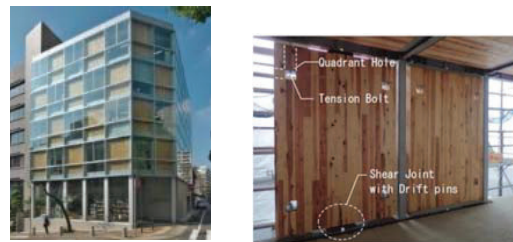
Building of steel frames with CLT infill in Japan: Hyogo Forestry Hall [4](left figure). Details of CLT panel with steel frame (right figure) [5]
